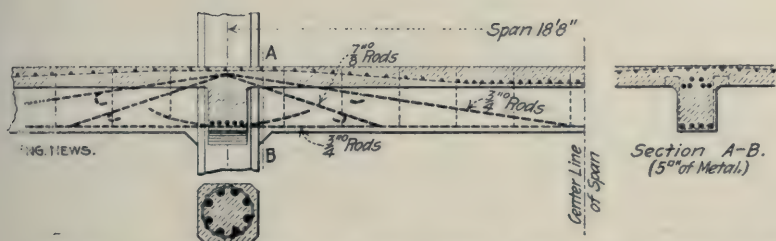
Typical beam in new Aikens building, Winnipeg, Man. J. Woodman, Architect; C. A. P. Turner, Engineer and Contractor. Patented July 6, 1909.
